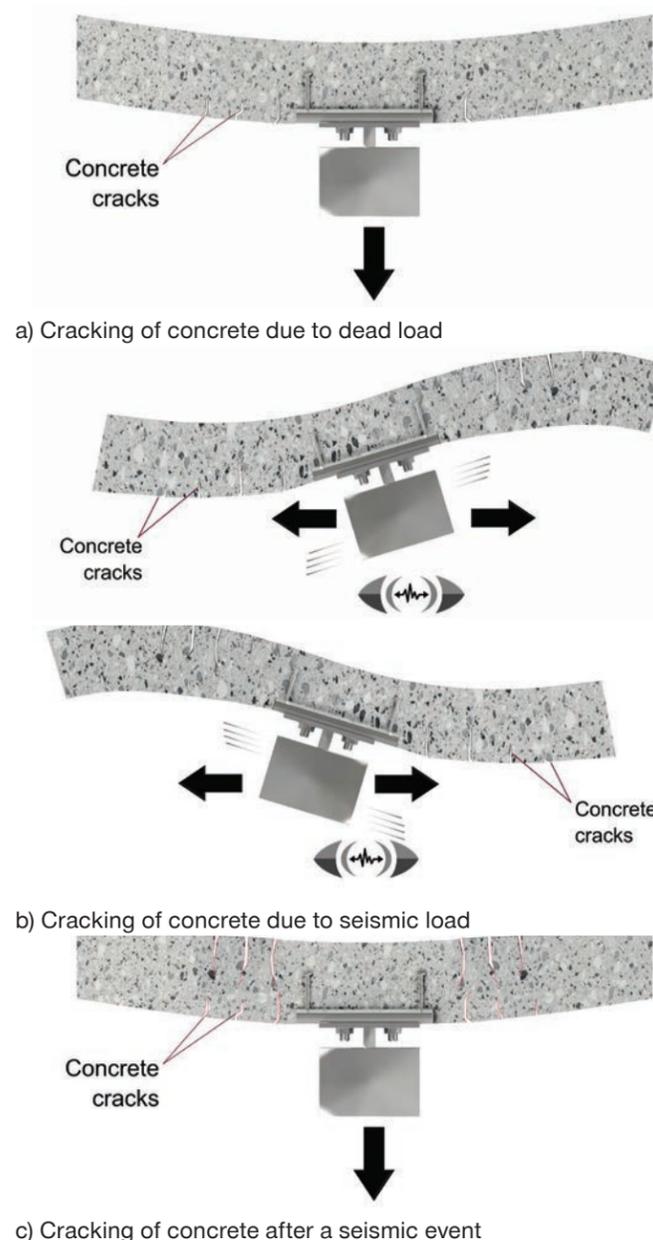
Cracks in a reinforced concrete member subjected to cycling loads.
